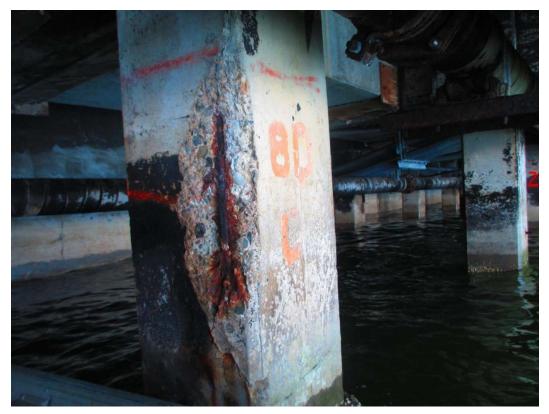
Pile rated Severe due to corrosion spalling at Pier 2
